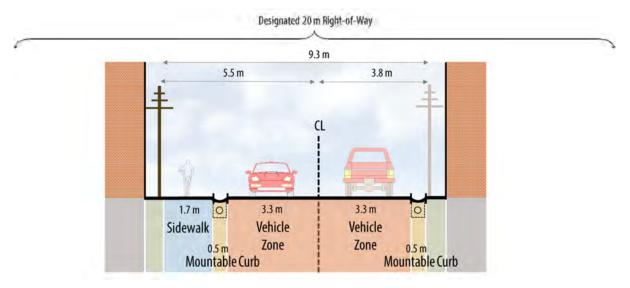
9.3 m Platform Semi-Rural Cross-Section with Sidewalk for Belfountain Village (Shaws Creek Rd. to Mississauga Rd. / Old Main St.)
